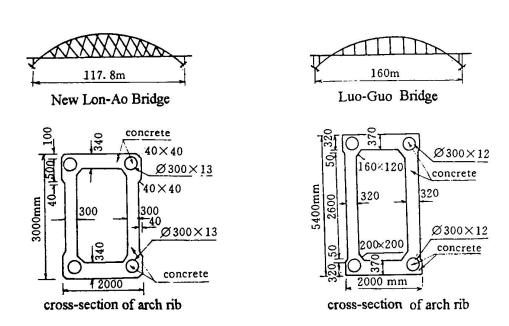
Lon-Ao Bridge and Luo-Guo Bridge
